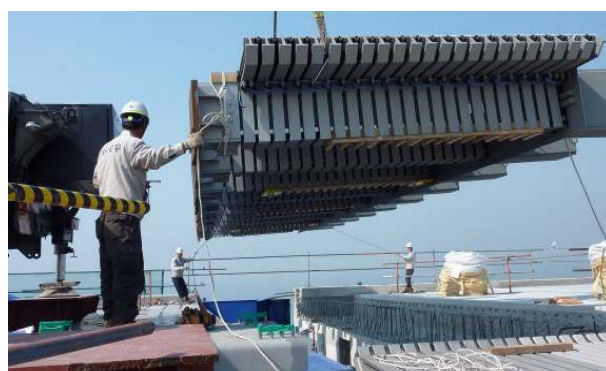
Installation of a Tensa-Modular joint in a concrete bridge deck, showing the support bars beneath the surface that span the bridge gap
